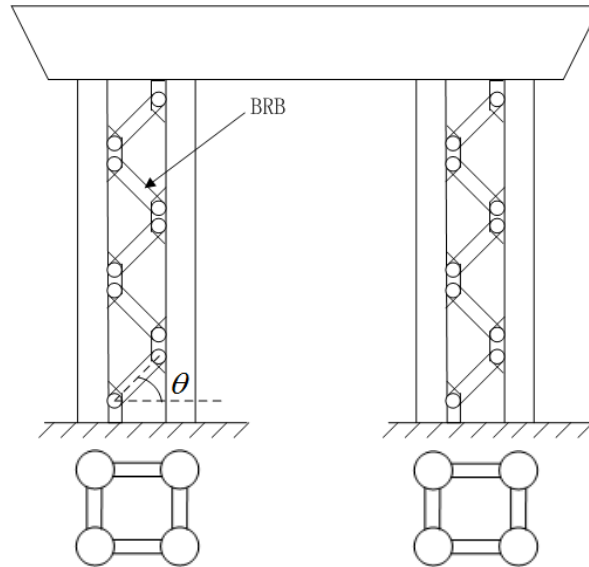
Box pier with BRBs in the transverse direction having four BRBs between closely spaced columns
